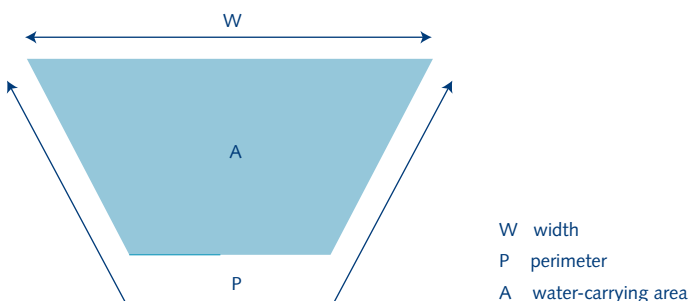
Typical gutter cross-section (trapezoidal gutter)
